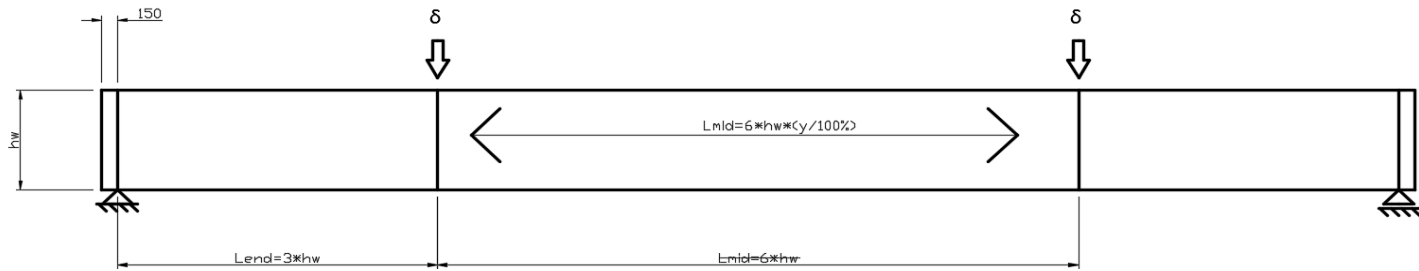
GEOMETRY OF THE TESTED PLATE GIRDERS
